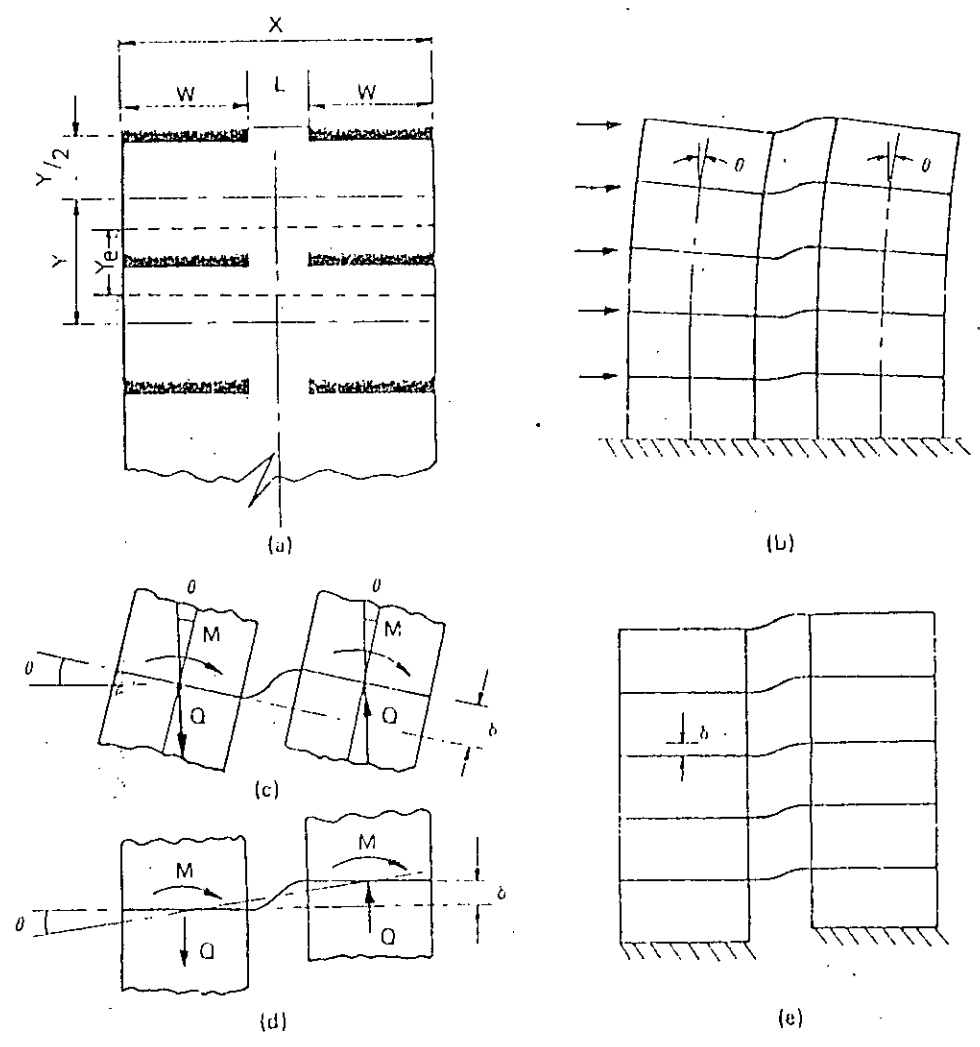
Structural Actions of Coupled Shear Wall-Slab Structure Subjected to Lateral Loads or Differential Movement
